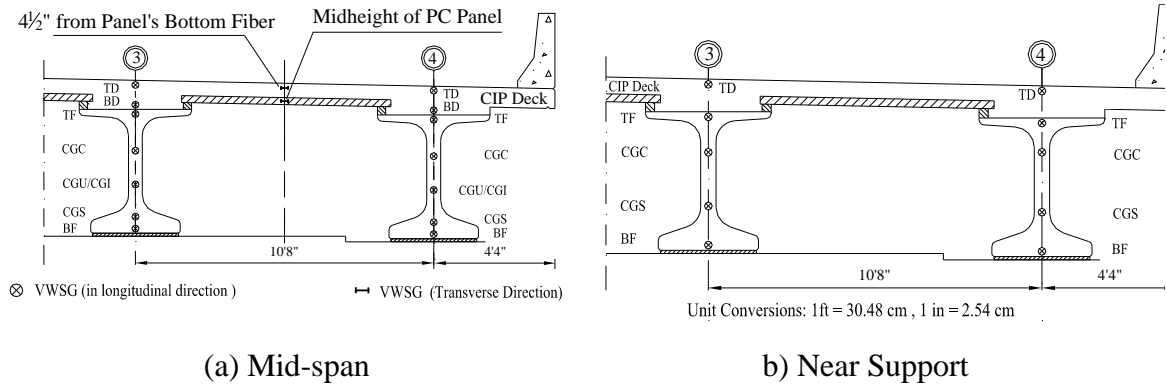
VWSG Installation Detail through the Different Girders' Sections
